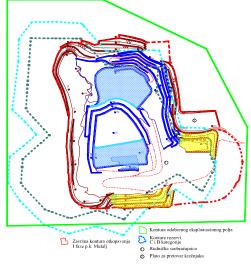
Plan of excavation in the IV year of the OP Mutalj - I stage
